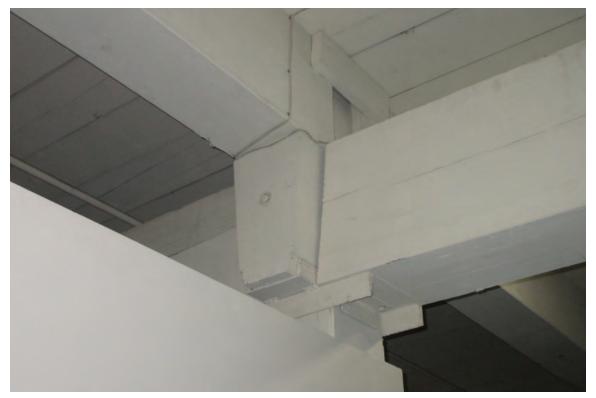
Typical wood timber column with steel c-channel capitals field welded back to back supporting the wood timber beams.
